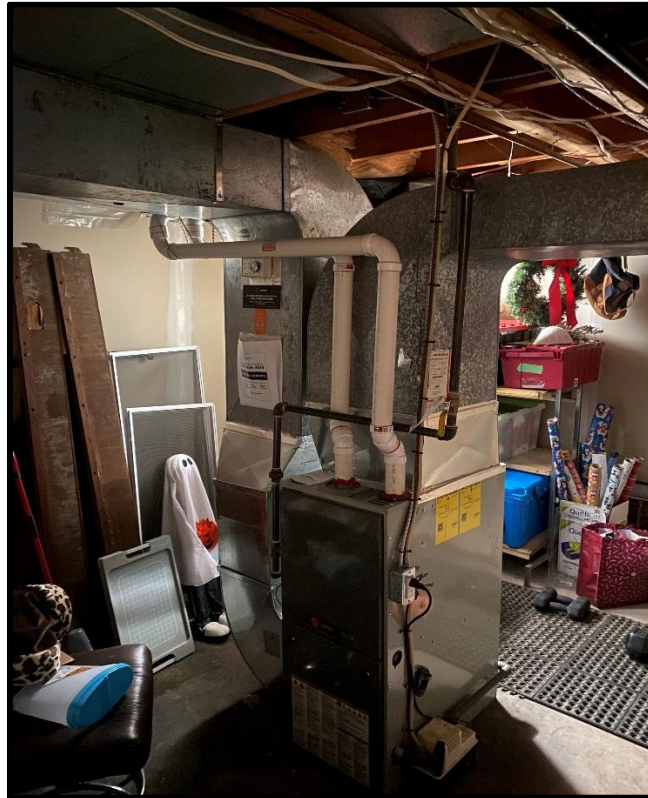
View inside of the 344 Winston Avenue dwelling.
